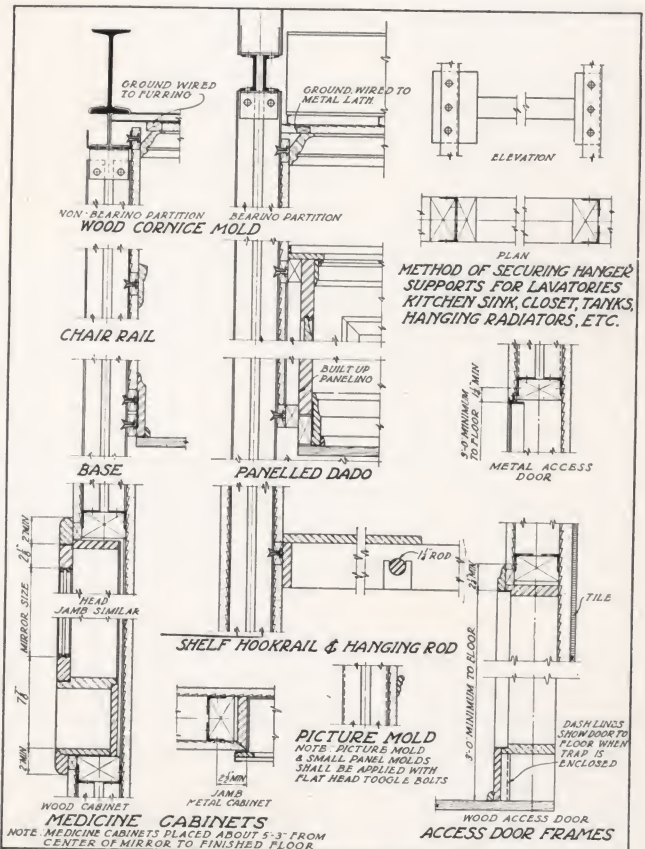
Typical Details Showing Installation of Cabinet Work, Paneling, etc.
